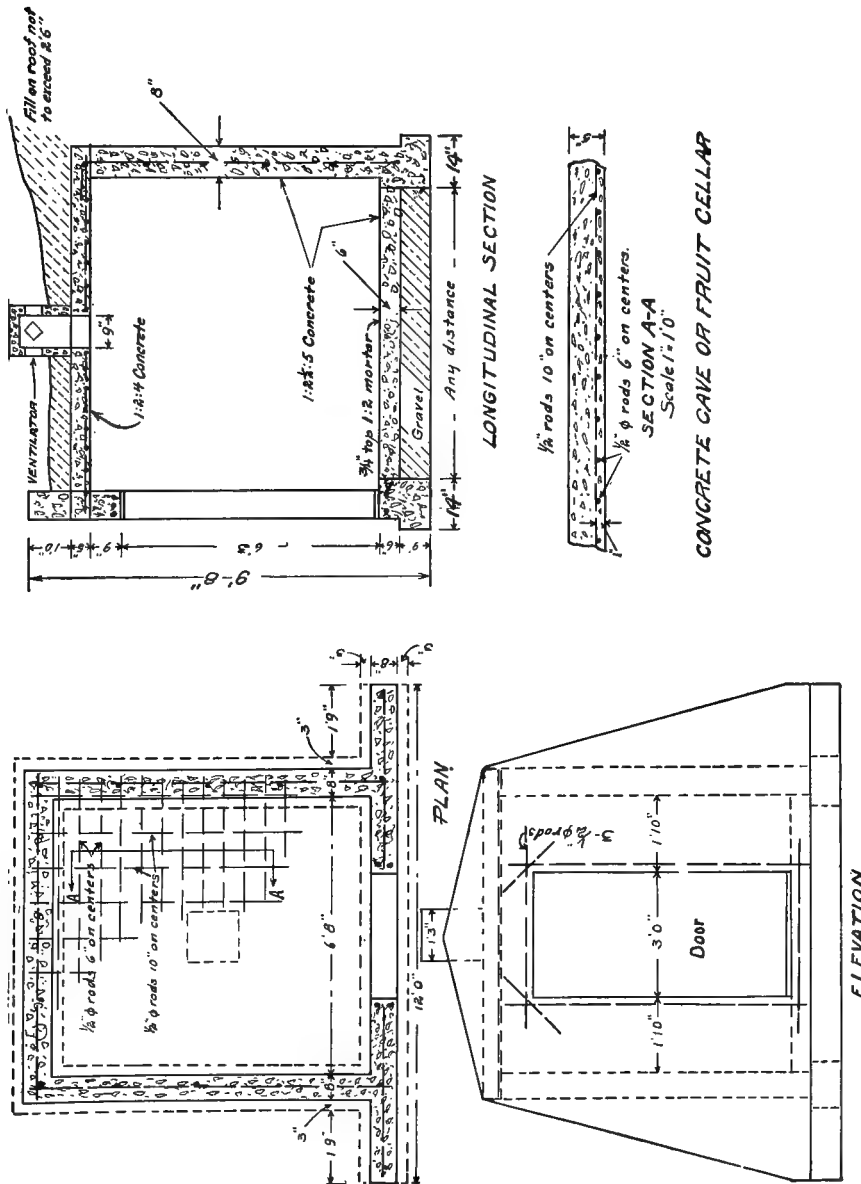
Plan and Elevation of a Flat Top Reinforced Concrete Root Cellar.
